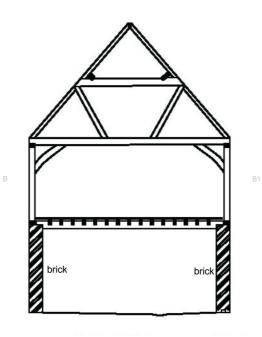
Structure 4, 18th-century granary/cow house cross-section of truss B.
